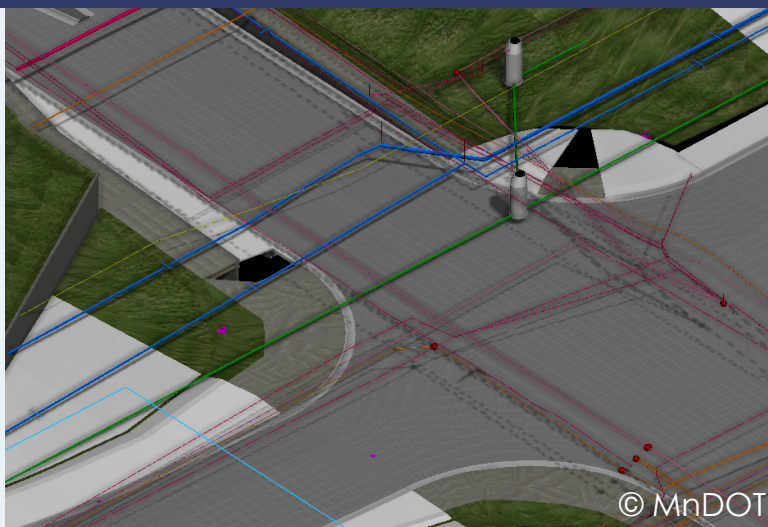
A rendering of a 3D design model showing existing utilities under the pavement.
